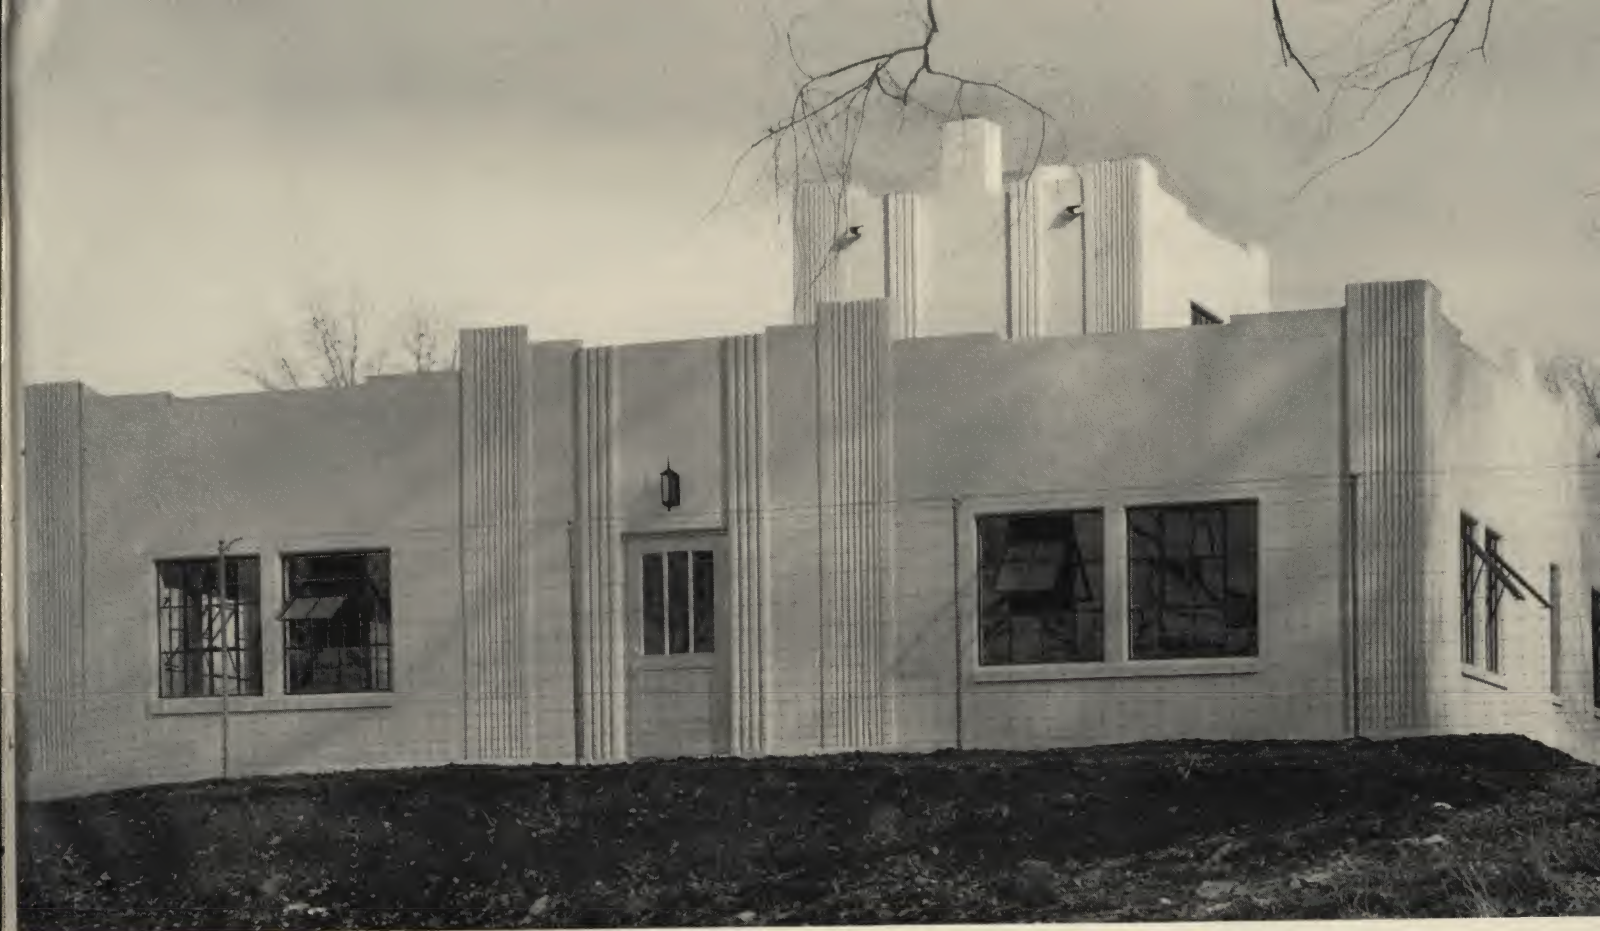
Fluted pilasters lend height to main building of the Sewage Disposal Plant, Vinton, Iowa. H. R. Green Co., engineer, Cedar Rapids; E. B. Spencer, contractor, Waterloo.
